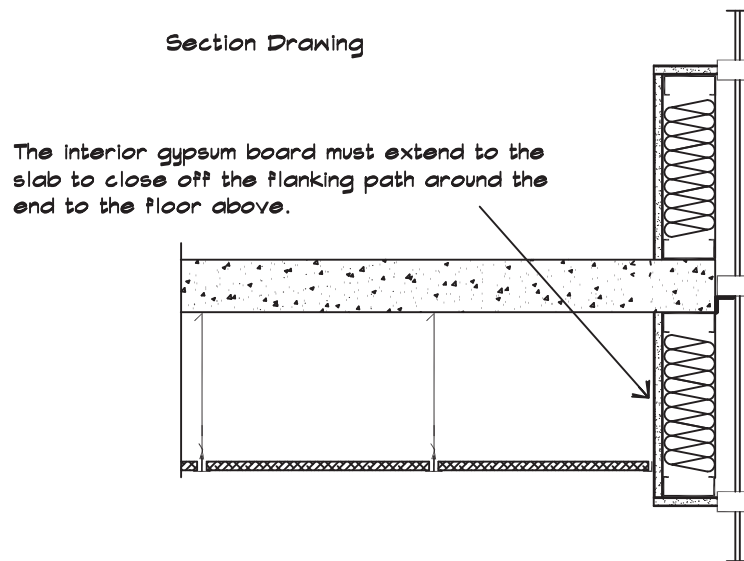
Flanking Around Slabs at Curtain Walls
